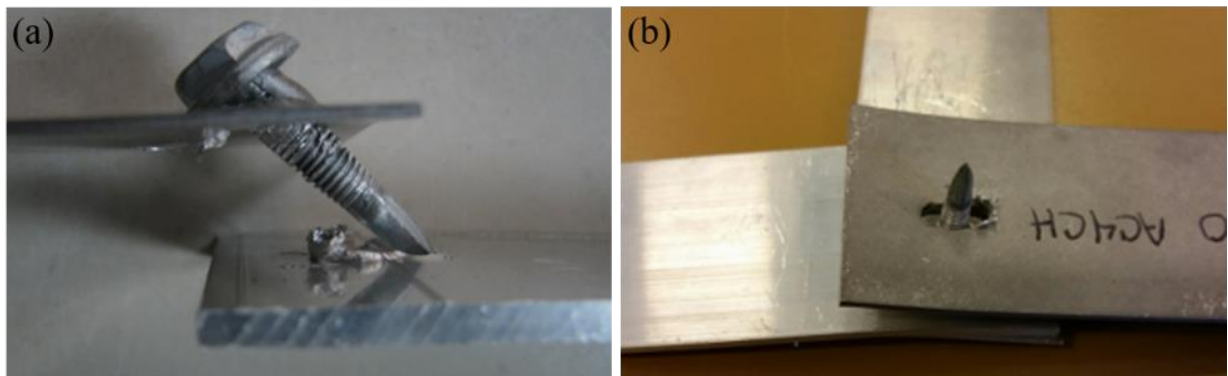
Screw pull-out failure mechanism (a) 2T stackup, (b) 3T stackup
